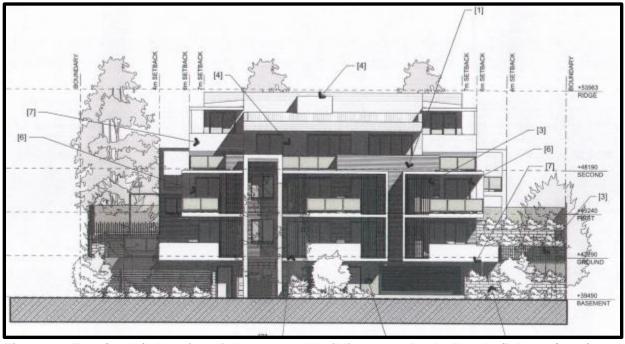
Font (north) elevation of the approved building at 5-7 Peake Parade (DA2013/0404)
